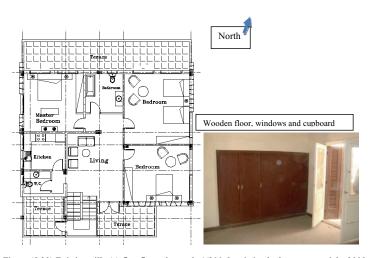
Existing villa (a) first floor plan scale 1/200 & existing bedrooms materials, 2009
